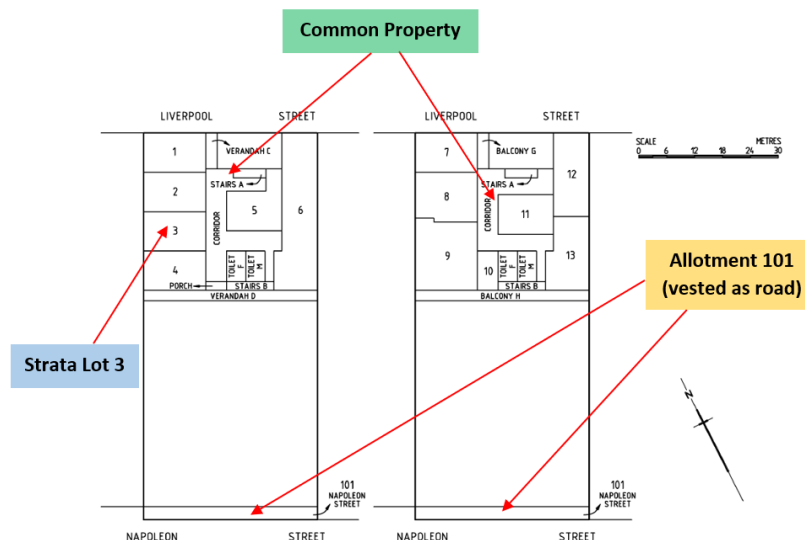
Floor plan diagram examples for Community Strata Plan with an allotment to vest as public road
